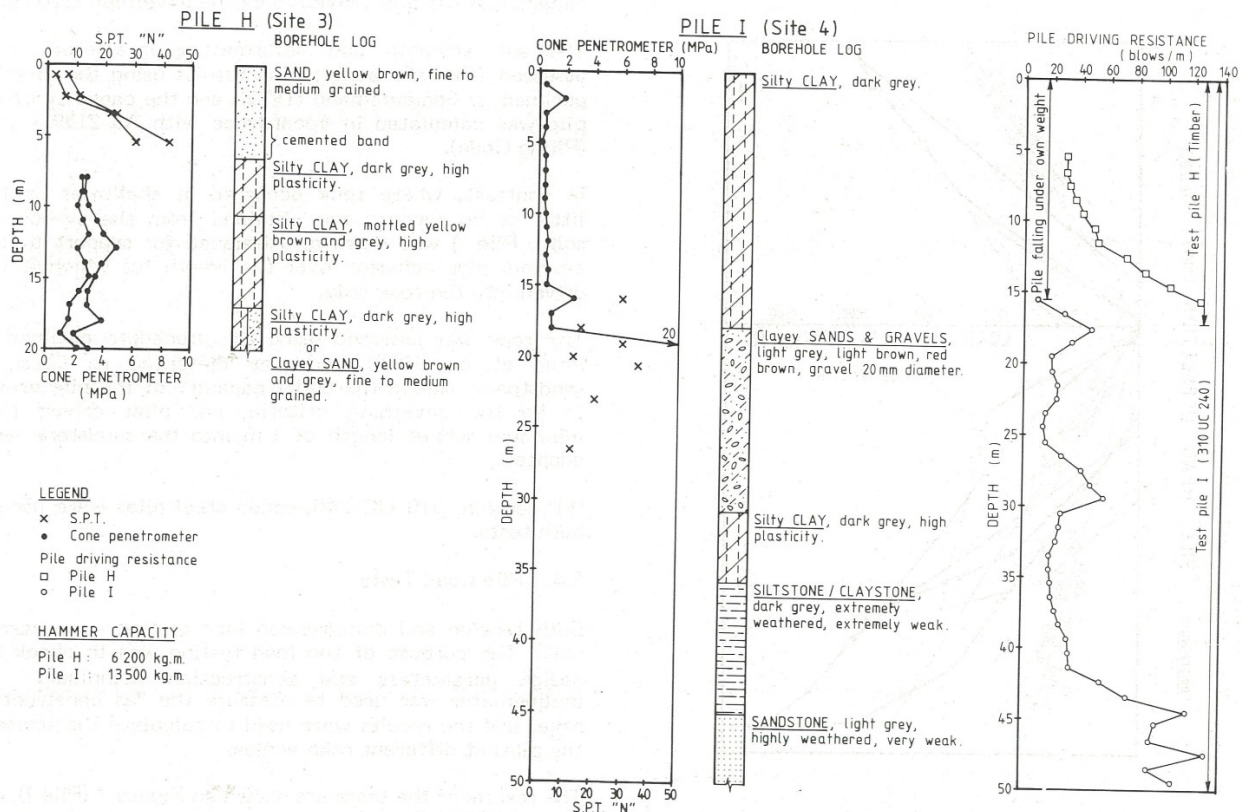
Foundation Conditions - Pile H (Site 3) and Pile I (Site 4)
